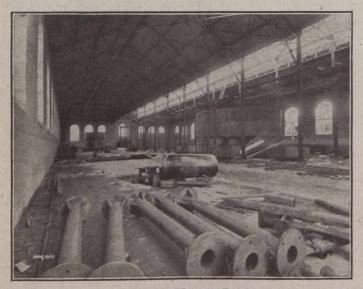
Interior of Filter House, Looking Towards the North, at Start of Tank Erection. Cast Iron Supporting Columns for Filters Shown in Foreground.
